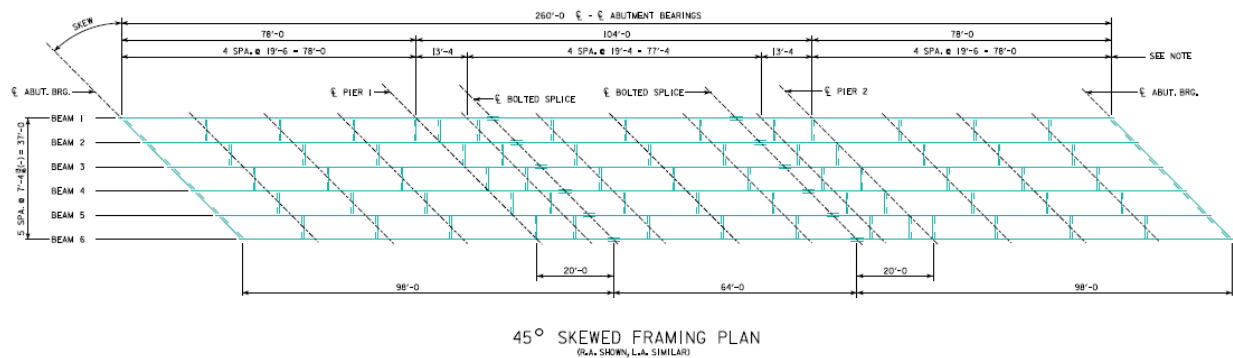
45° skew 260 ft Standard Bridge framing plan
